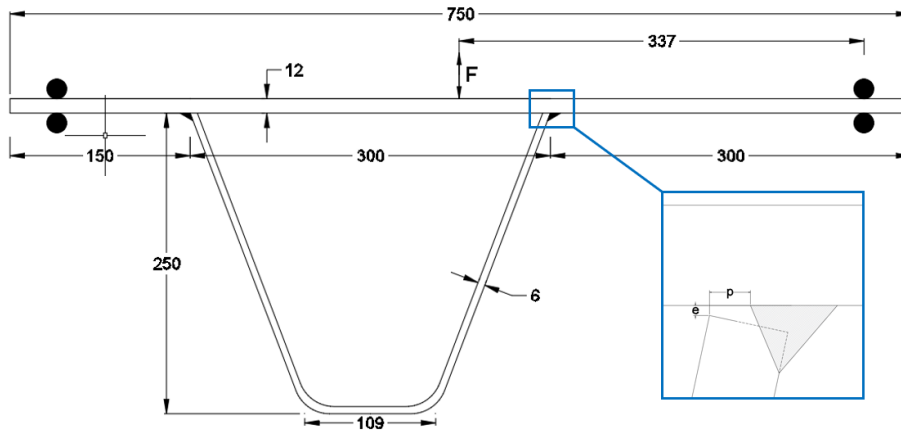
RD welded joint fatigue test setup and weld geometry.
